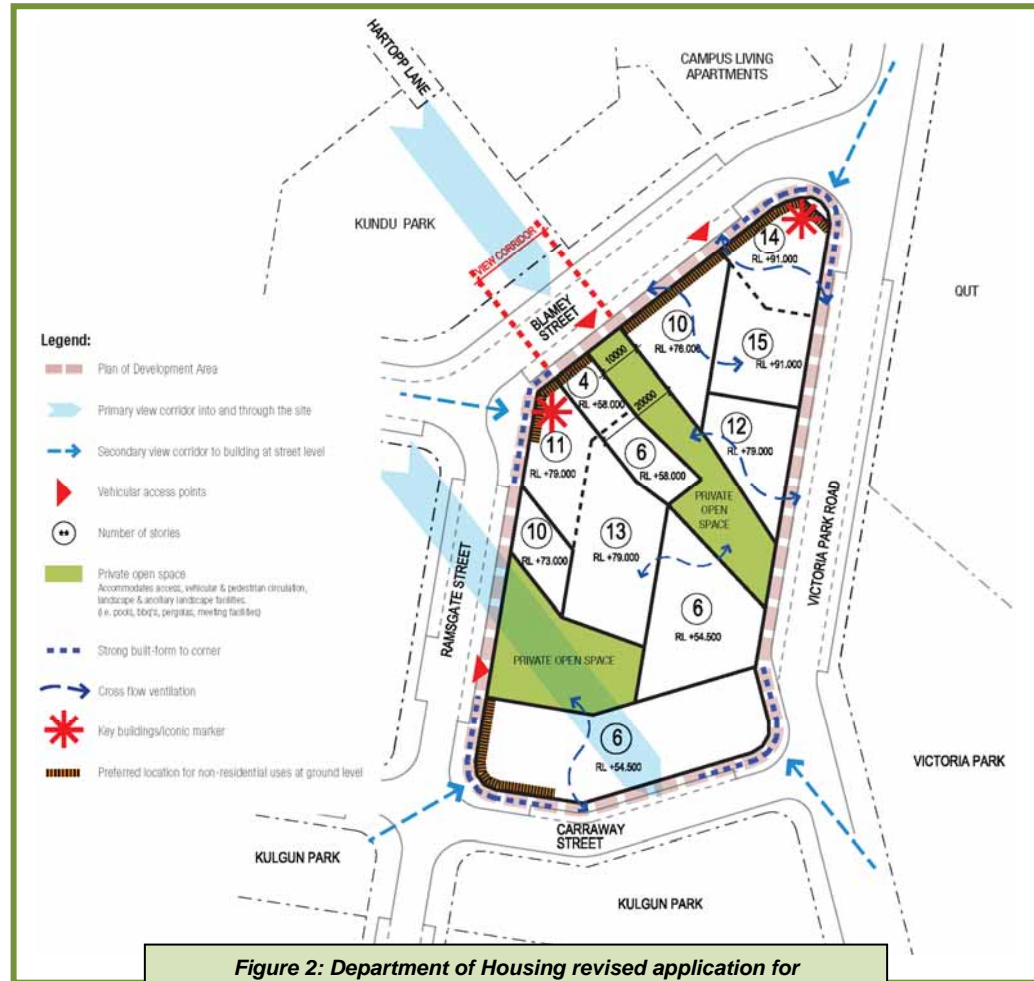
Department of Housing revised application for amendments to Lot 17 planning scheme
